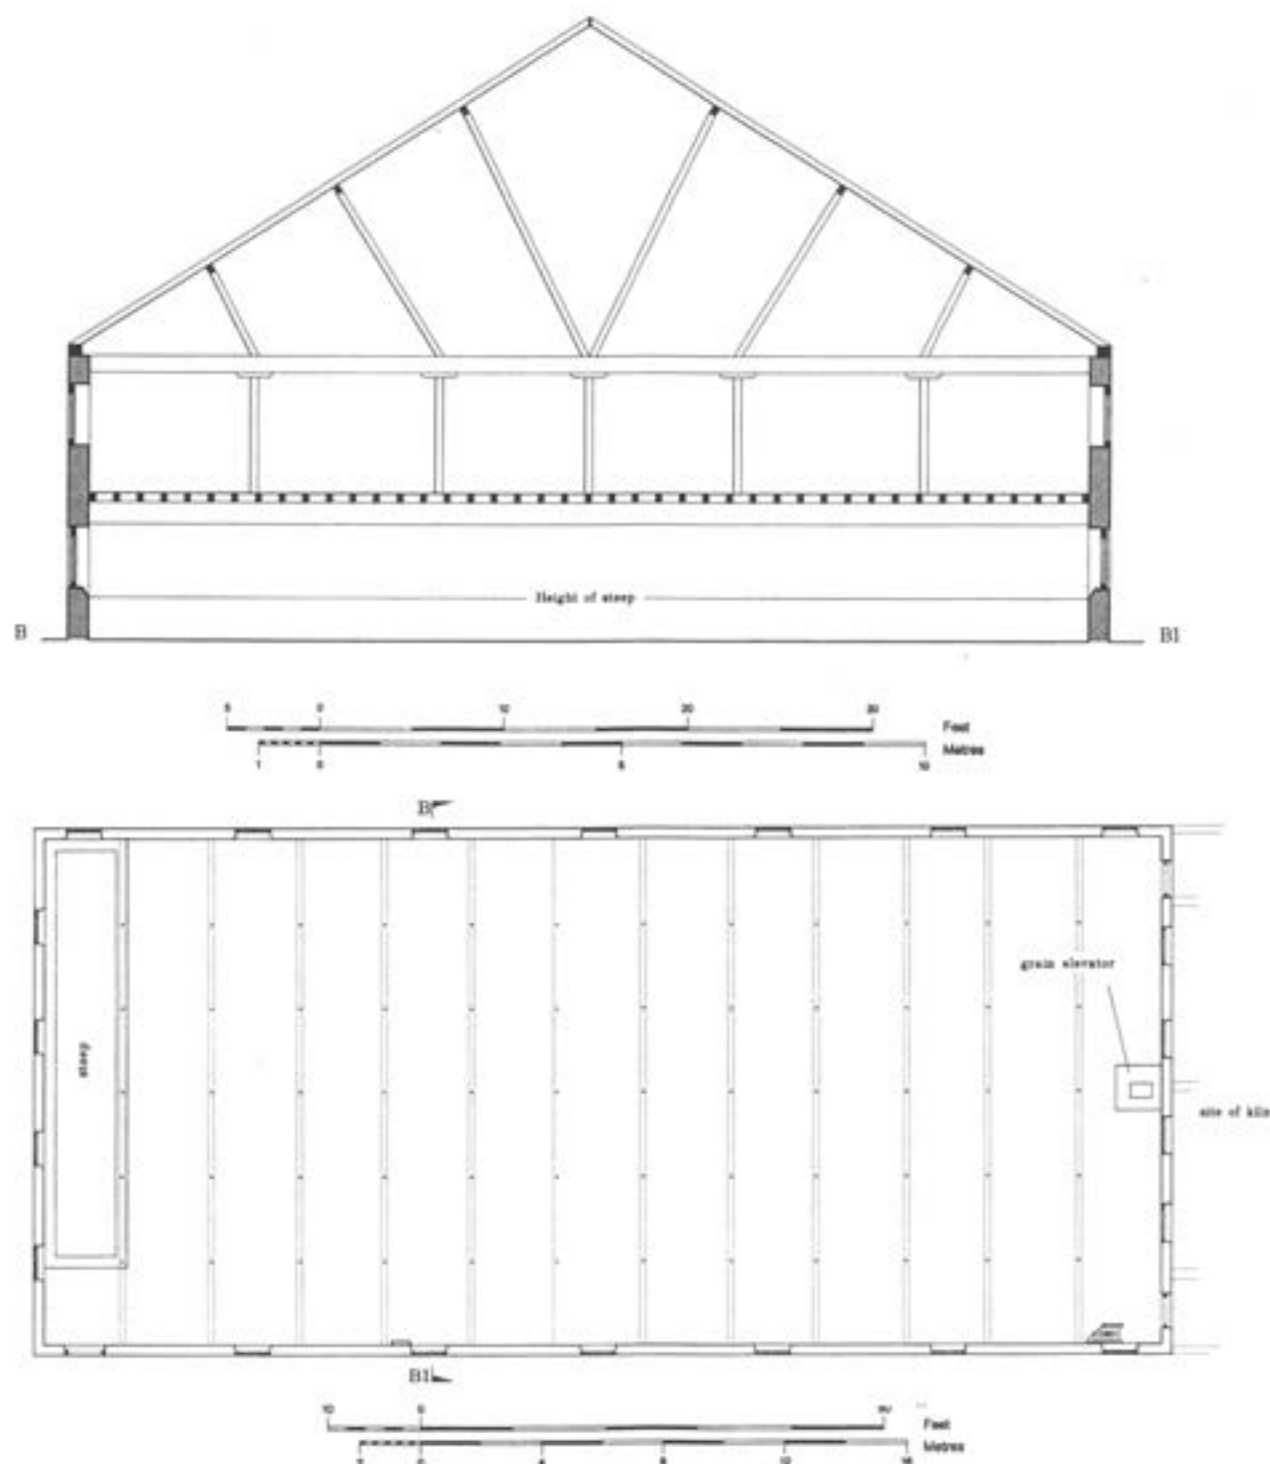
Malthouse No. 6, ground plan and section (© Crown Copyright. NMR).
